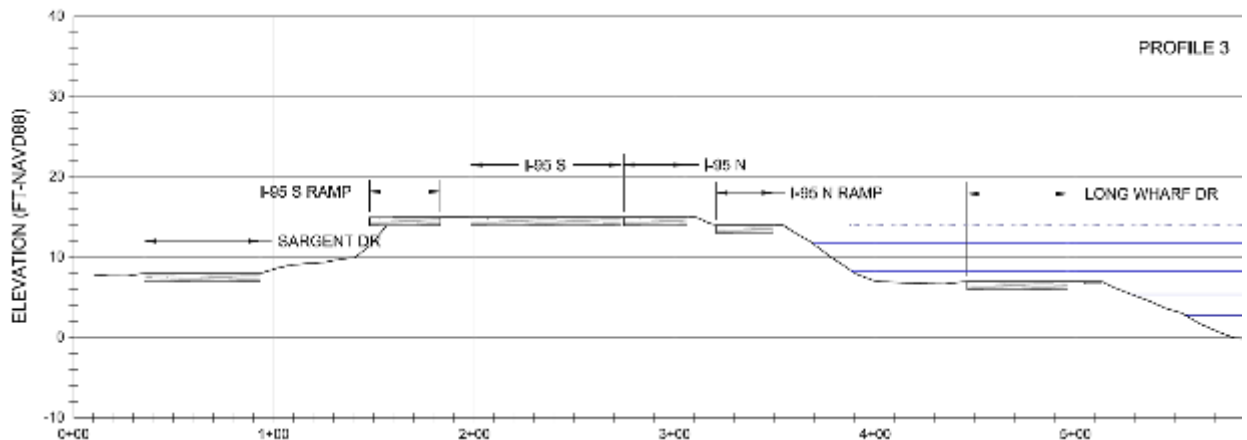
I-95 embankment section near entrance ramp (see Figure 5 for location)
